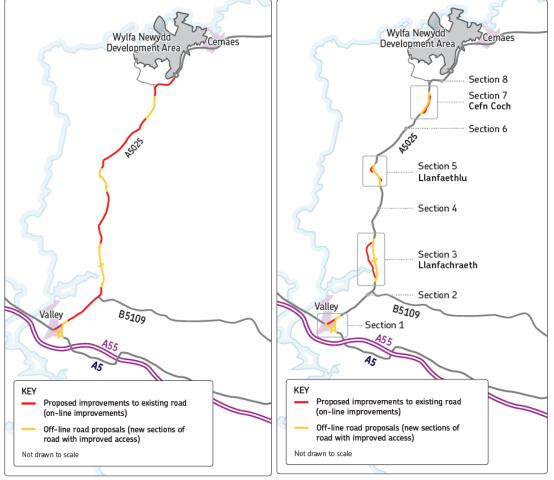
Proposed A5025 Highway Improvements – Overview Plan
